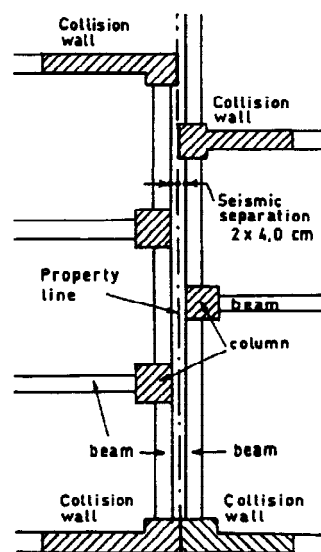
Horizontal section of two adjacent building frames with collision walls
